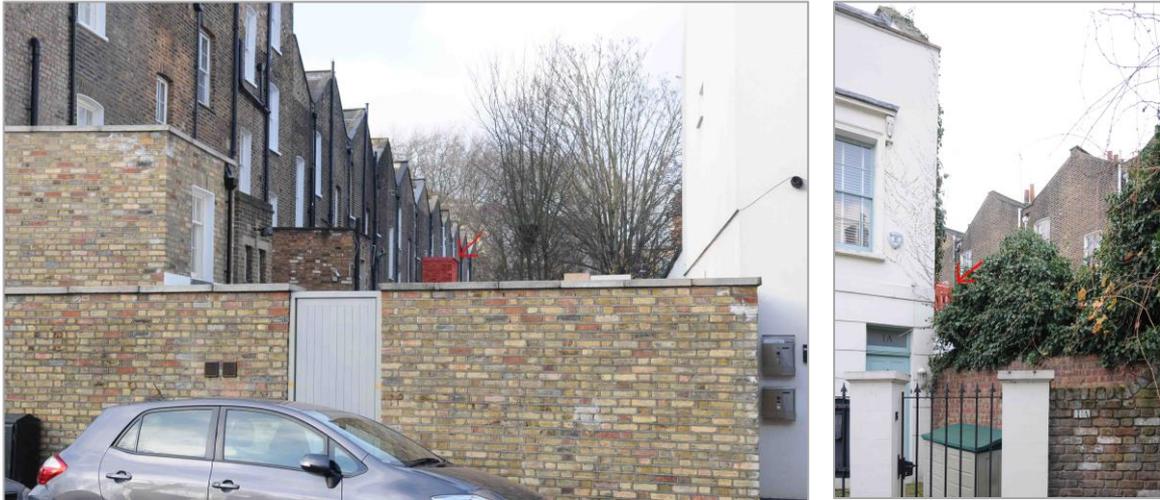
[Left] View to the rear from boundary wall in Wilmot Place Second floor extension to No.124 indicated in red and arrowed. Fig.8 [Right] View to the rear over boundary wall in Reed's Place. The second floor extension to No.124 is barely visible but indicated in red and arrowed
